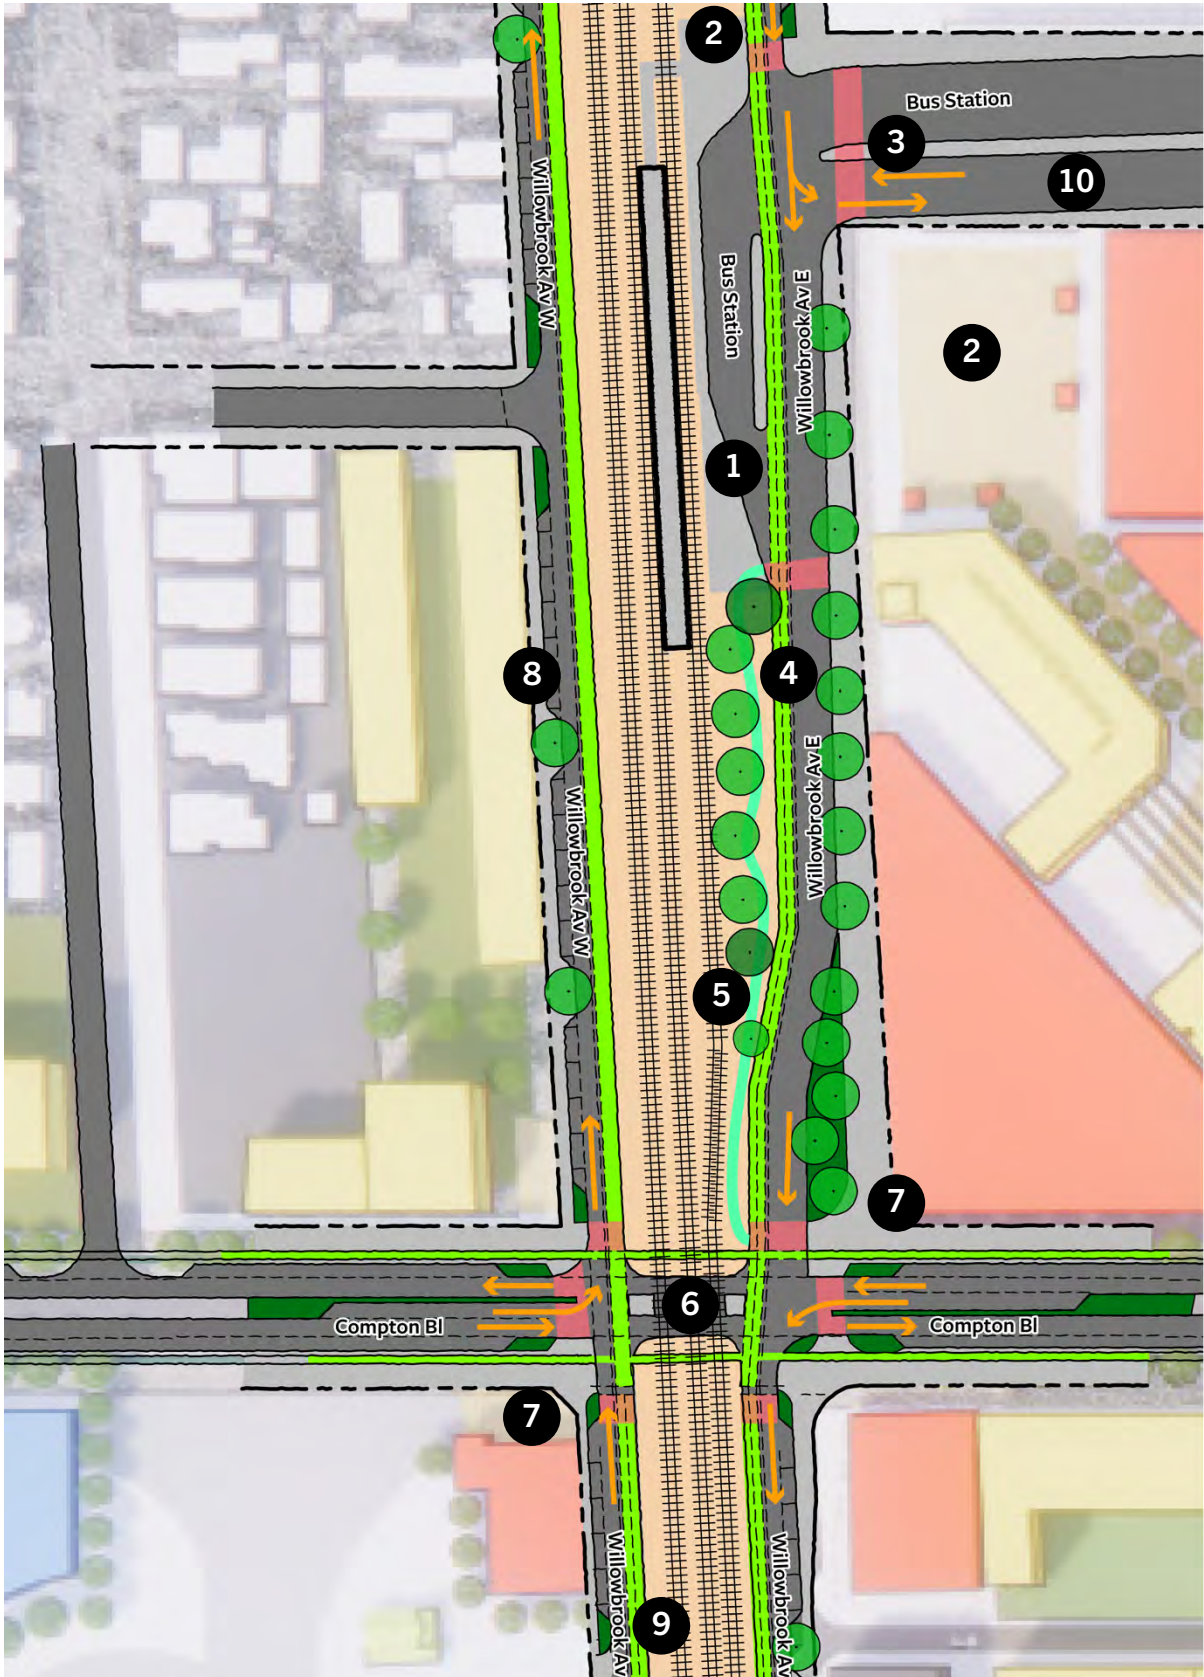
Willowbrook Avenue Preferred Alternative (B-Reverse Couplet) Plan and Key Features.
